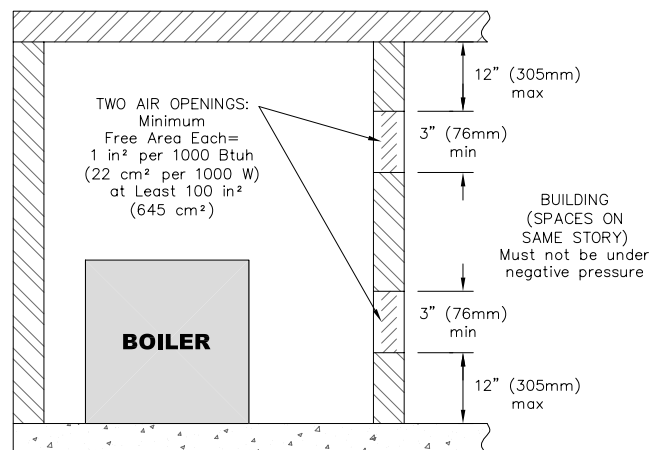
Air Openings – All Air from Indoors on the Same Floor
